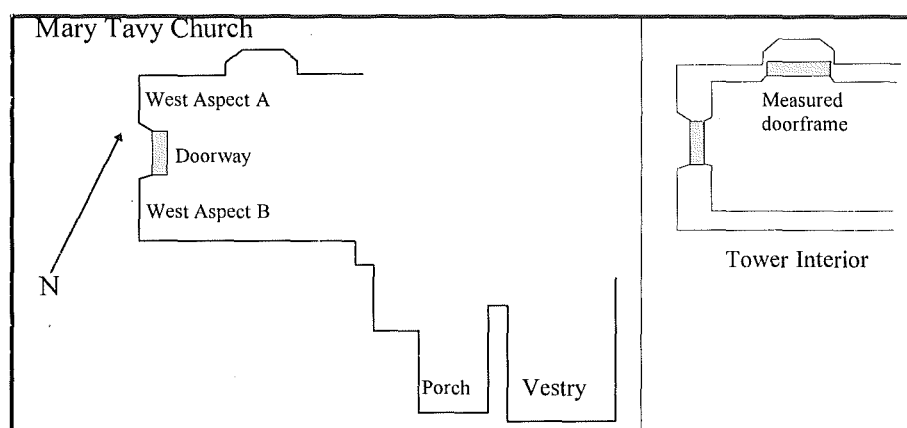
Site plan of Mary Tavy, the tower and vestry.
